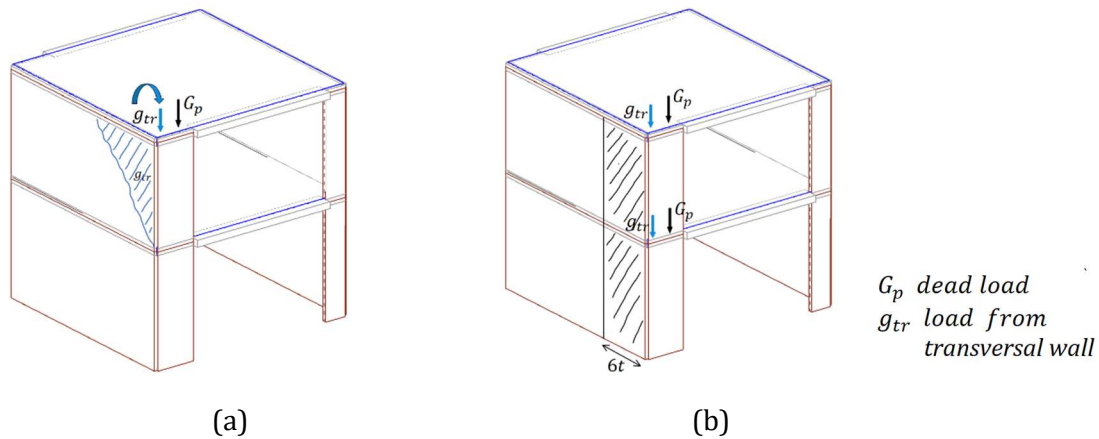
Flange dimension (a) and superimposed loads due to flange effect (b)
